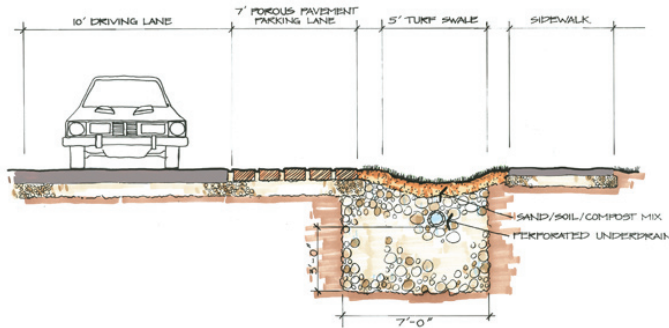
Stormwater Management - Parking, Gravel Infiltration Trench.
